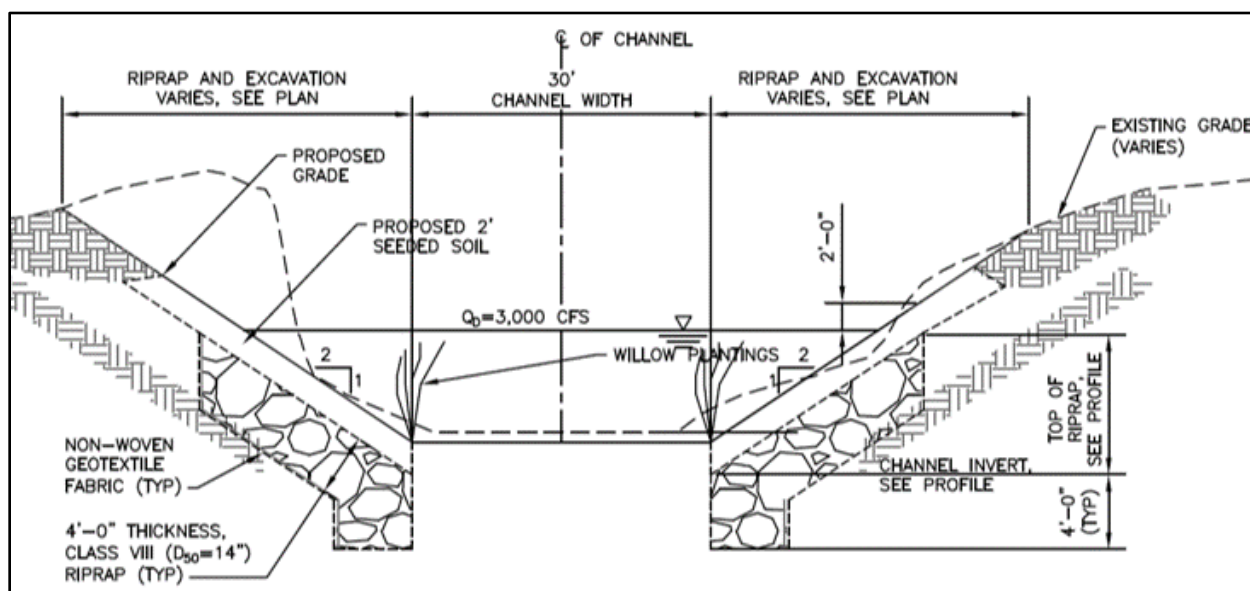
Riprap Channel Cross Section (3,000 cfs)
